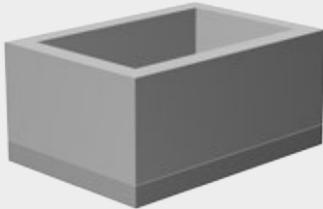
Example of a relatively simple, rectangular, single-storey basement built to be durably watertight with a Sika Watertight Concrete System
